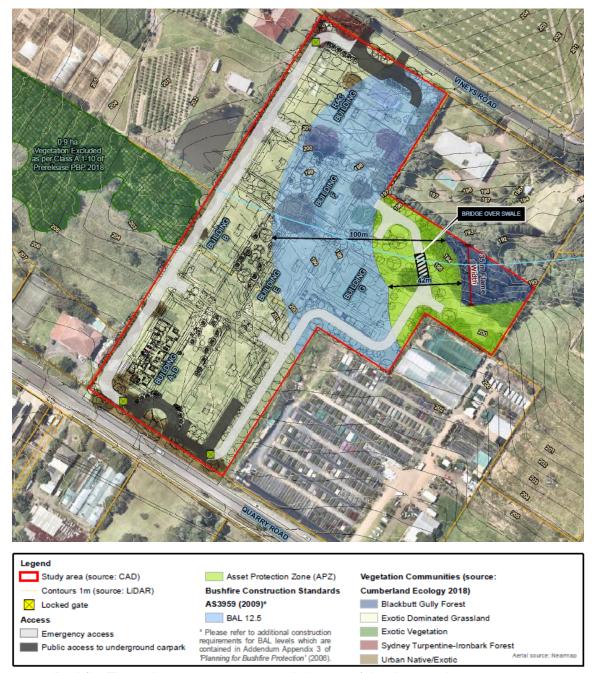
Bushfire Threat Assessment recommended terms of development layout
